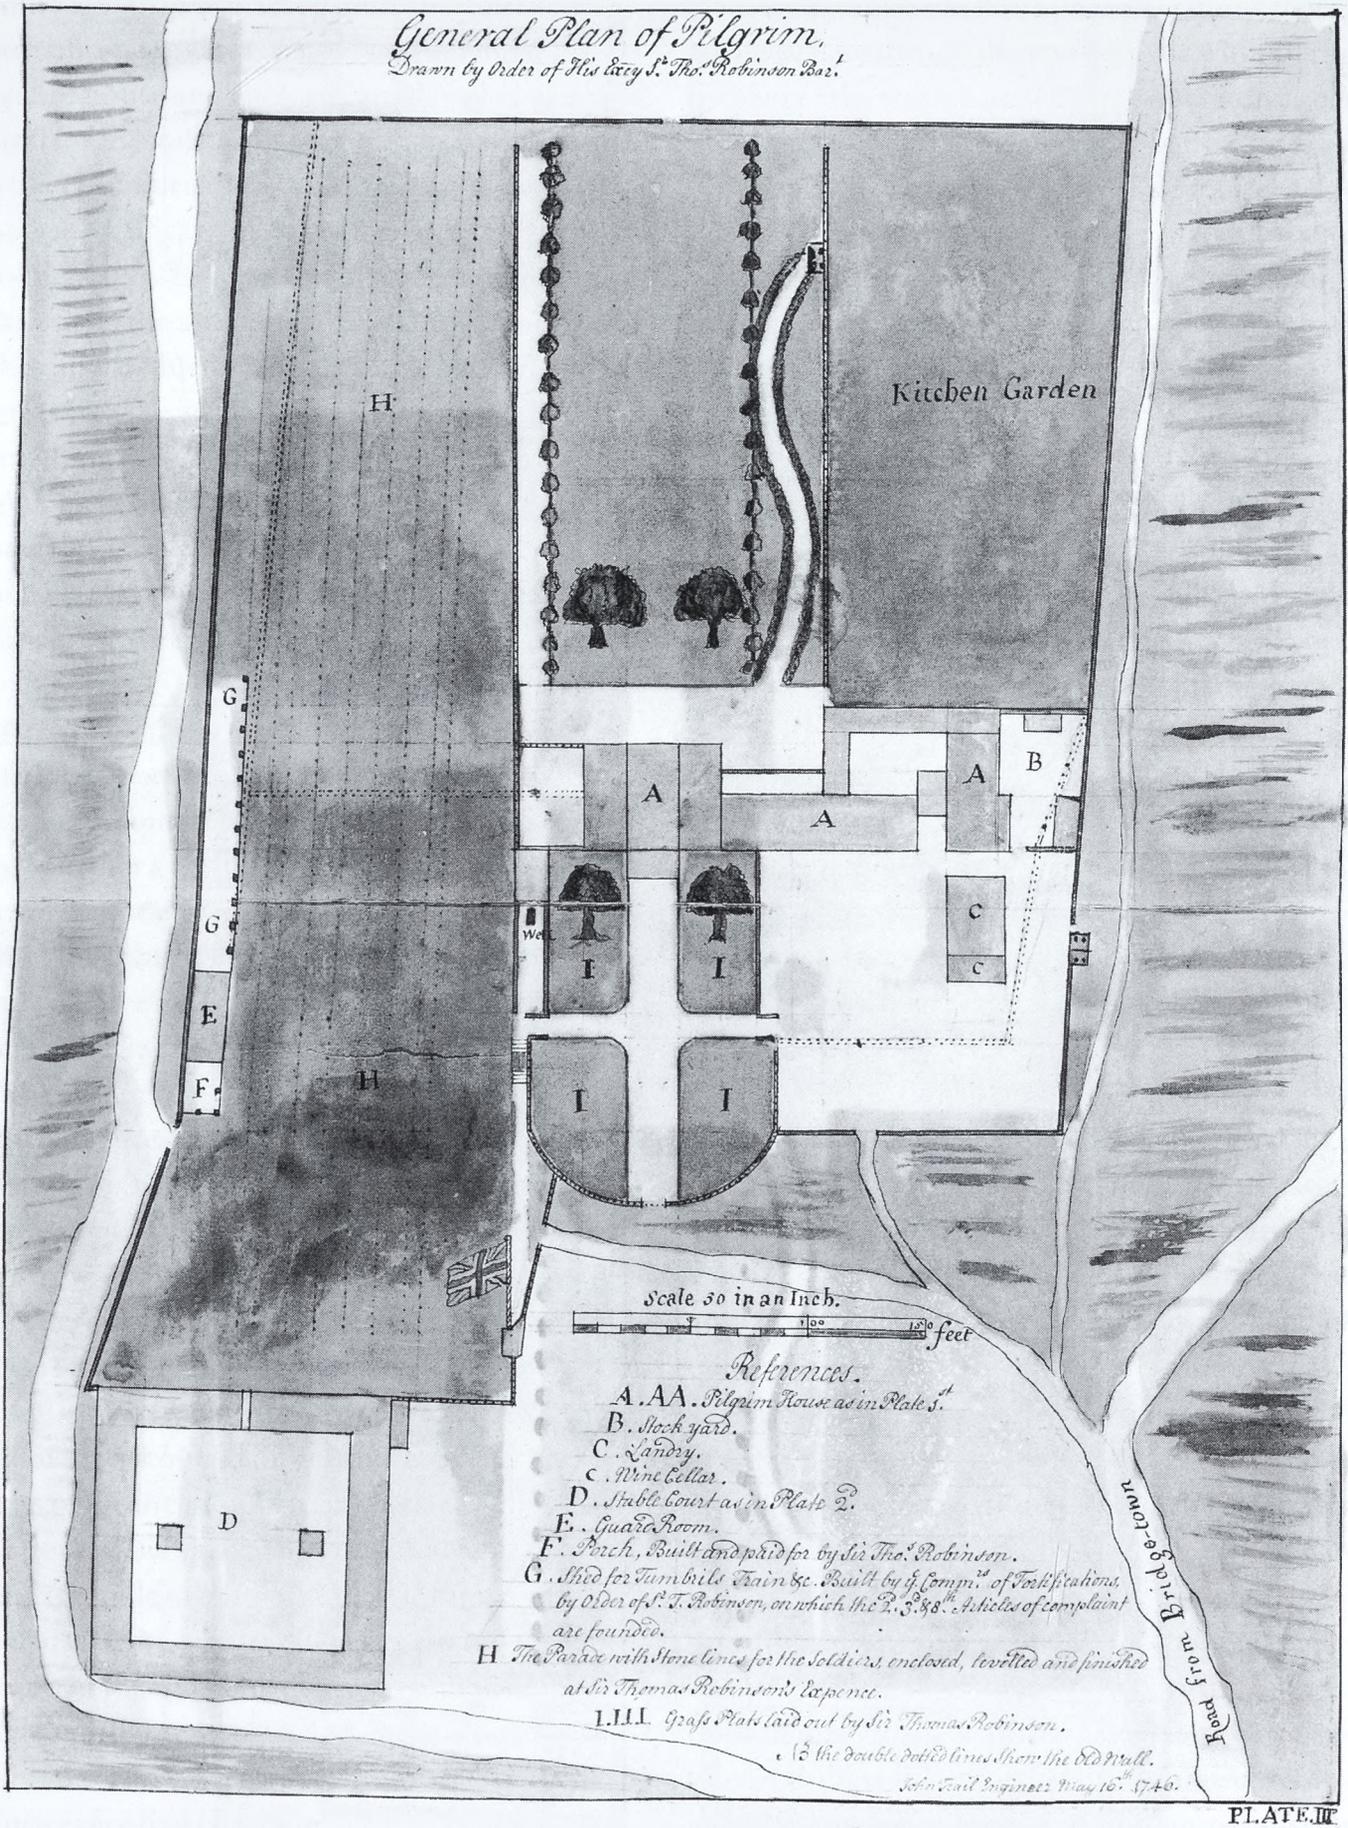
John Trail, plan of the Governor's house, garden and outbuildings, Pilgrim, Barbados, in 1746.
